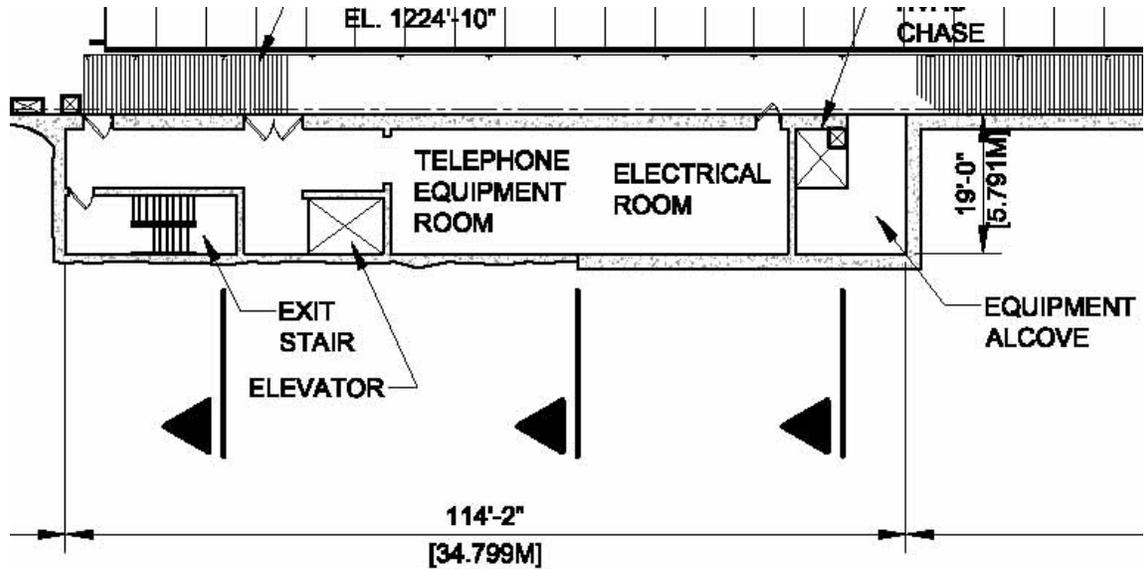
Floor Plan of Electrical Equipment Room at Grade
